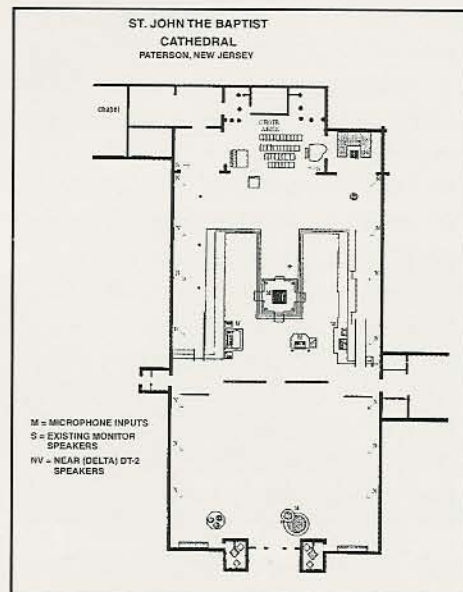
Floor plan of St. John the Baptist Cathedral in Paterson, New Jersey.
